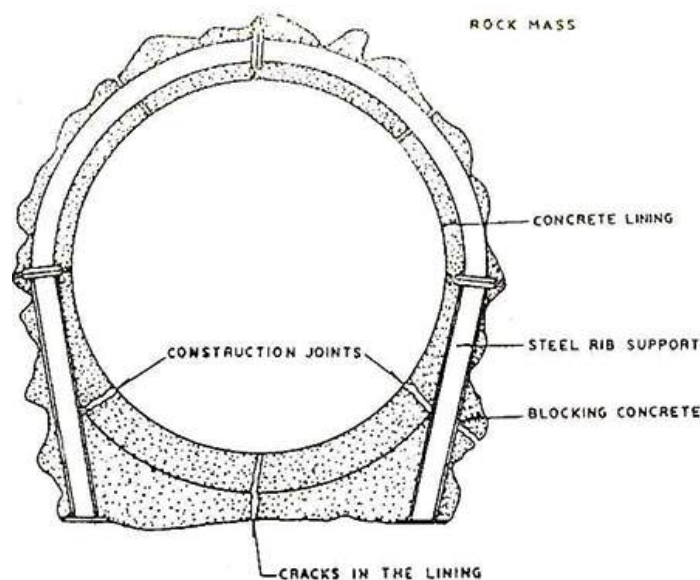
Development of cracks and opening of construction joints in a tunnel lining (after Singh et al., 1988)
